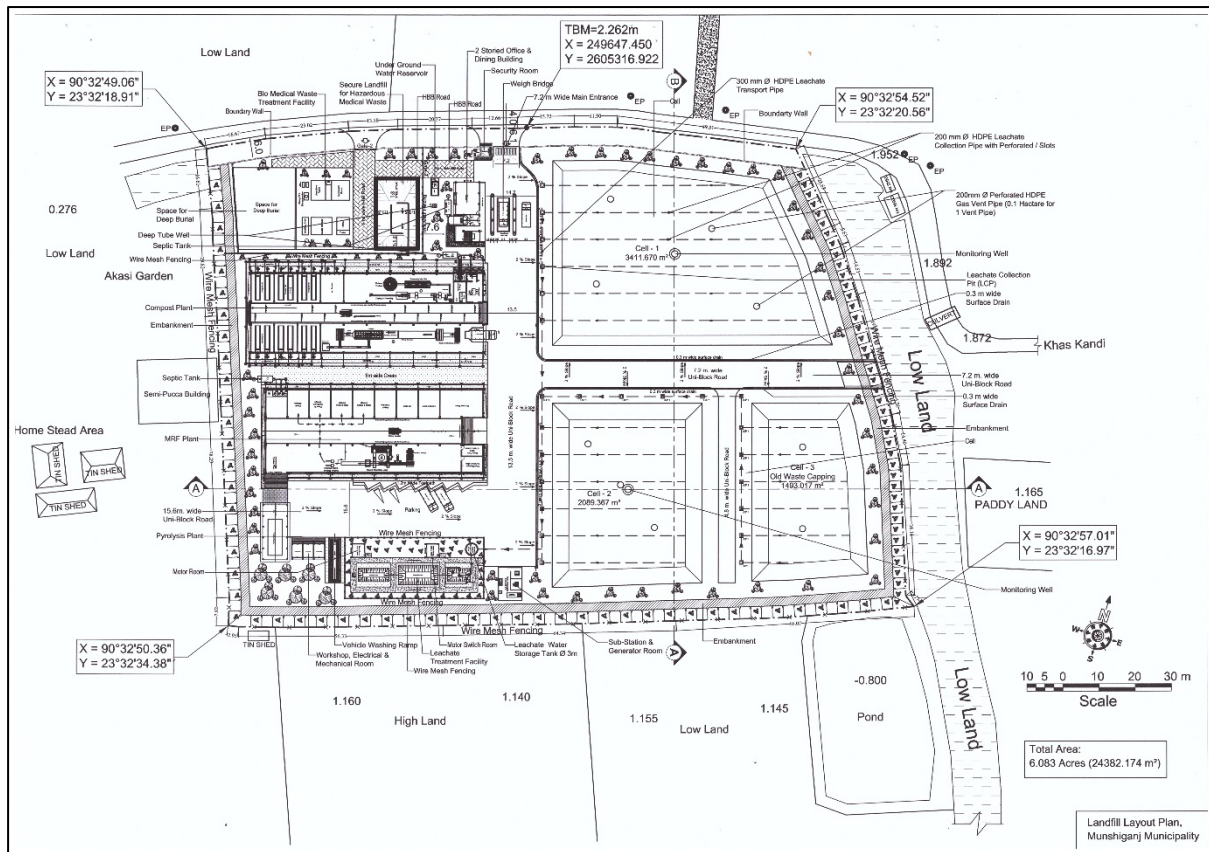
Layout plan for the proposed Integrated Landfill with Resource Recovery Facility
